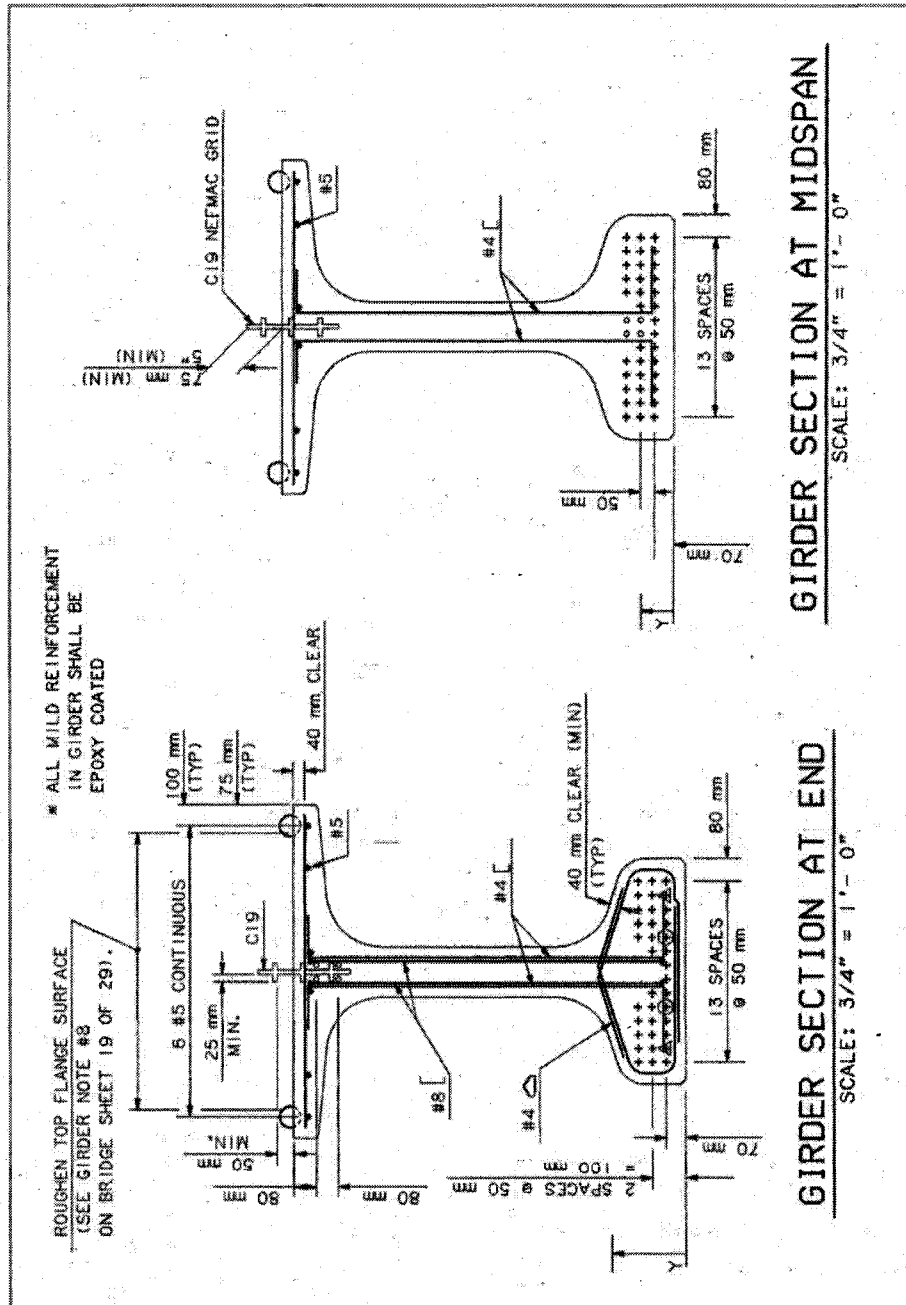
NEBT Section at end and midspan, showing prestressing steel (NHDOT Bureau of Bridge Design, 1999)
